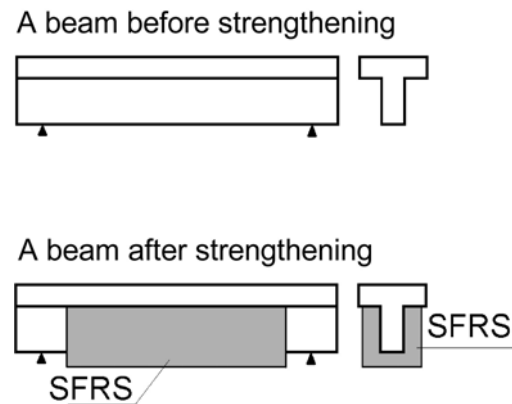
A Scheme of Strengthening a Concrete Beam by adding SFRS (Maidl 1995).
